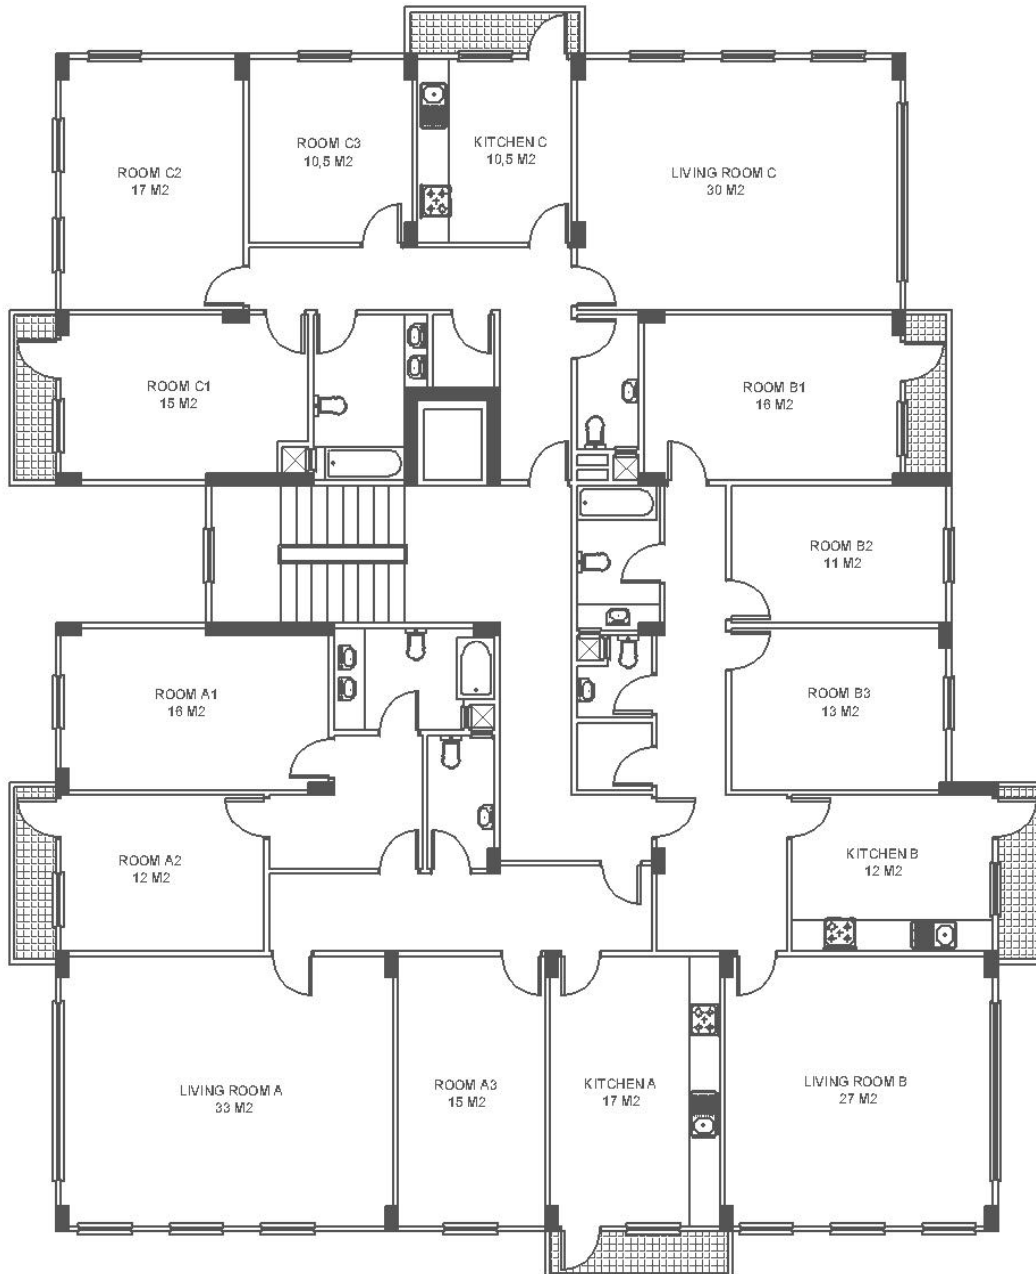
Architectural Plan of Model-2 with Irregular Structural System
